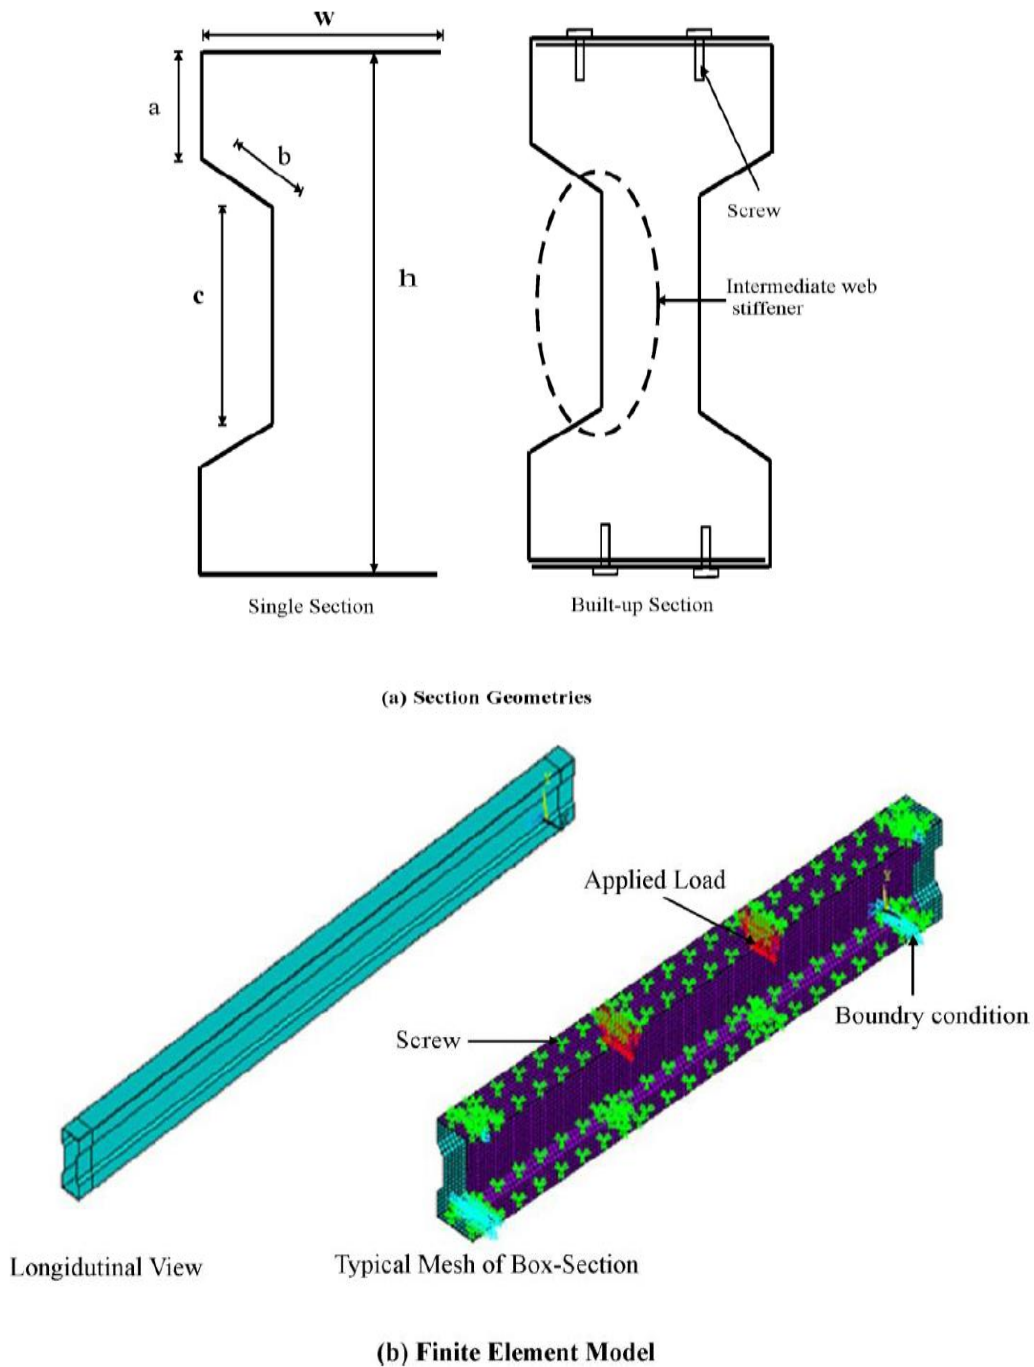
Details of specimen-cold-formed steel built-up closed section
